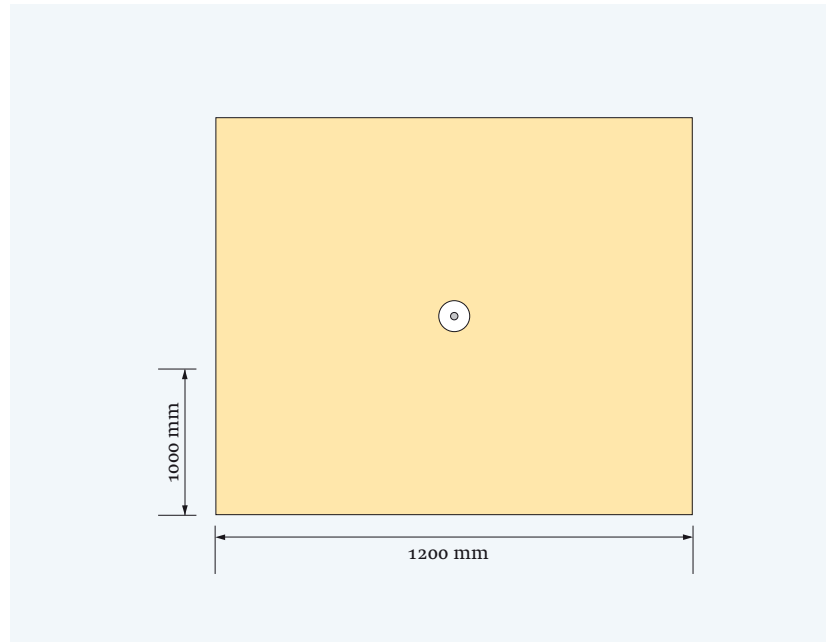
Location of mechanical fasteners for securing DuoRock roofing Board to metal, concrete and timber decks (see Mechanical fastening of insulation).
